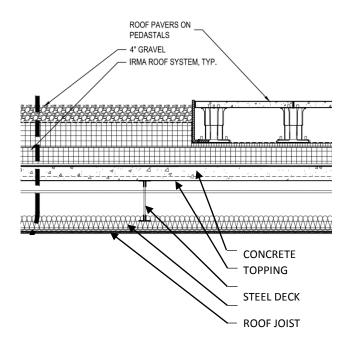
Section through roof at the 12th floor terrace level. From 3/A4.09.
